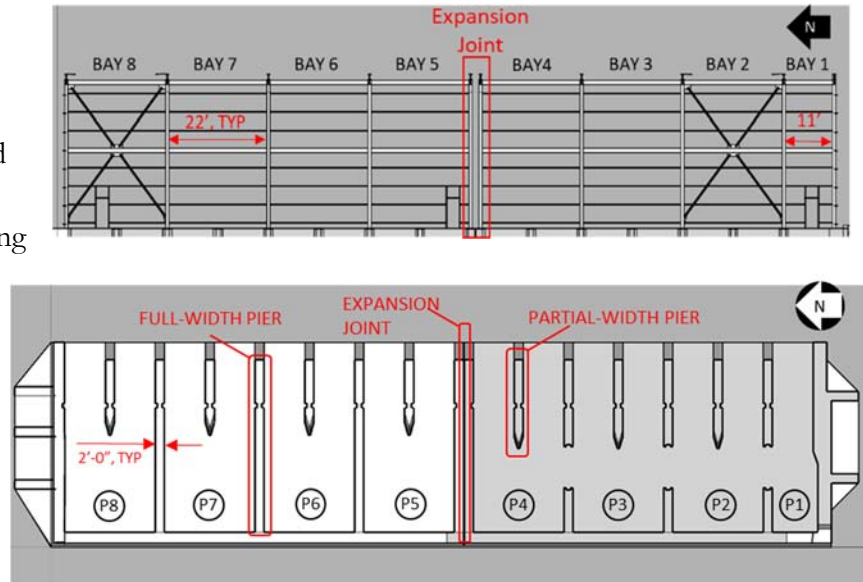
Plan View of Pump house (top) and Dam (bottom)
